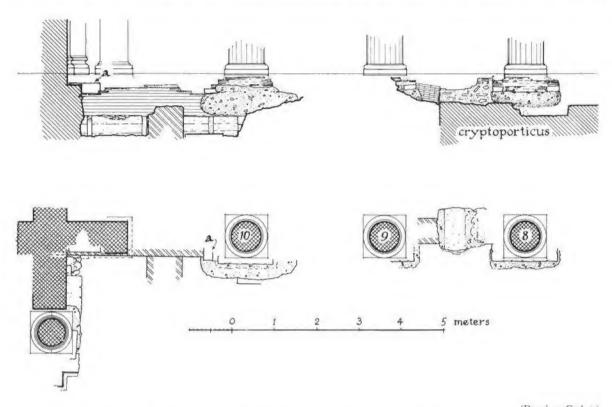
S. Pietro in Vincoli, South colonnade, plan and elevation of footings
